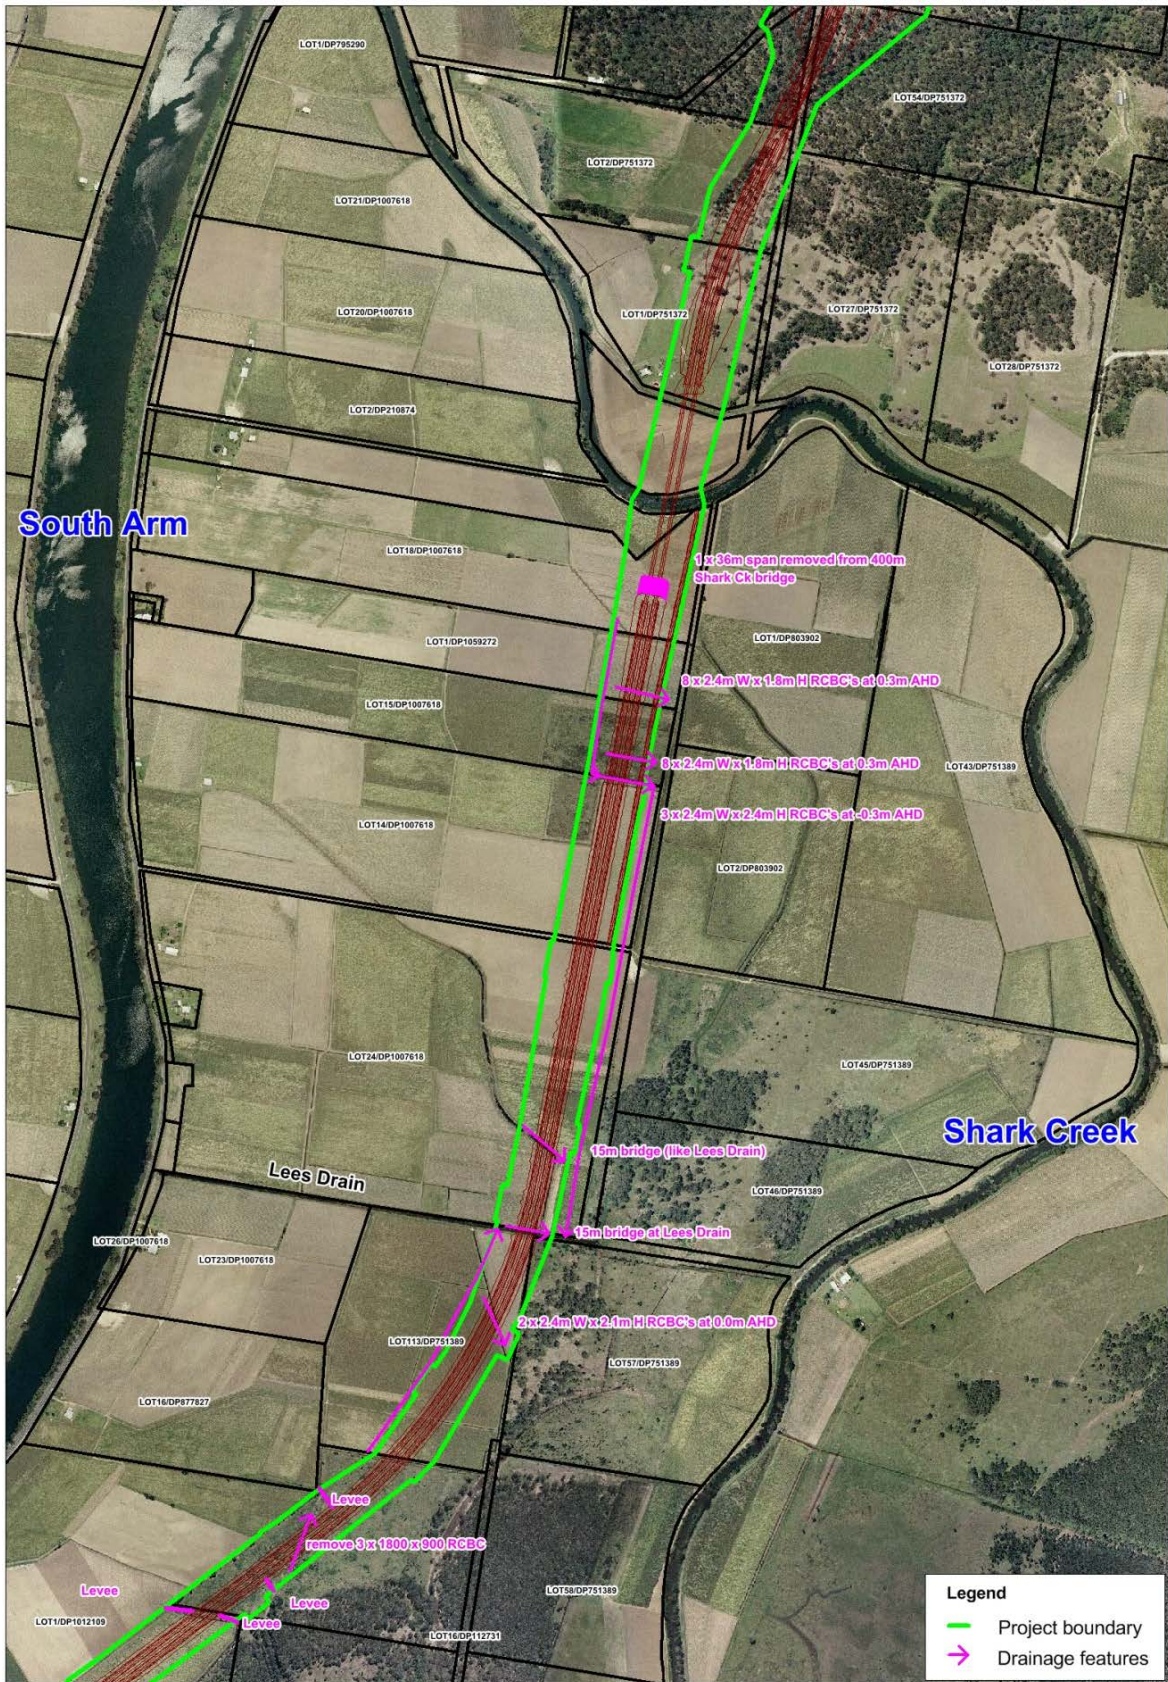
Potential alternative Shark Creek flood and drainage design at Lees Drain
